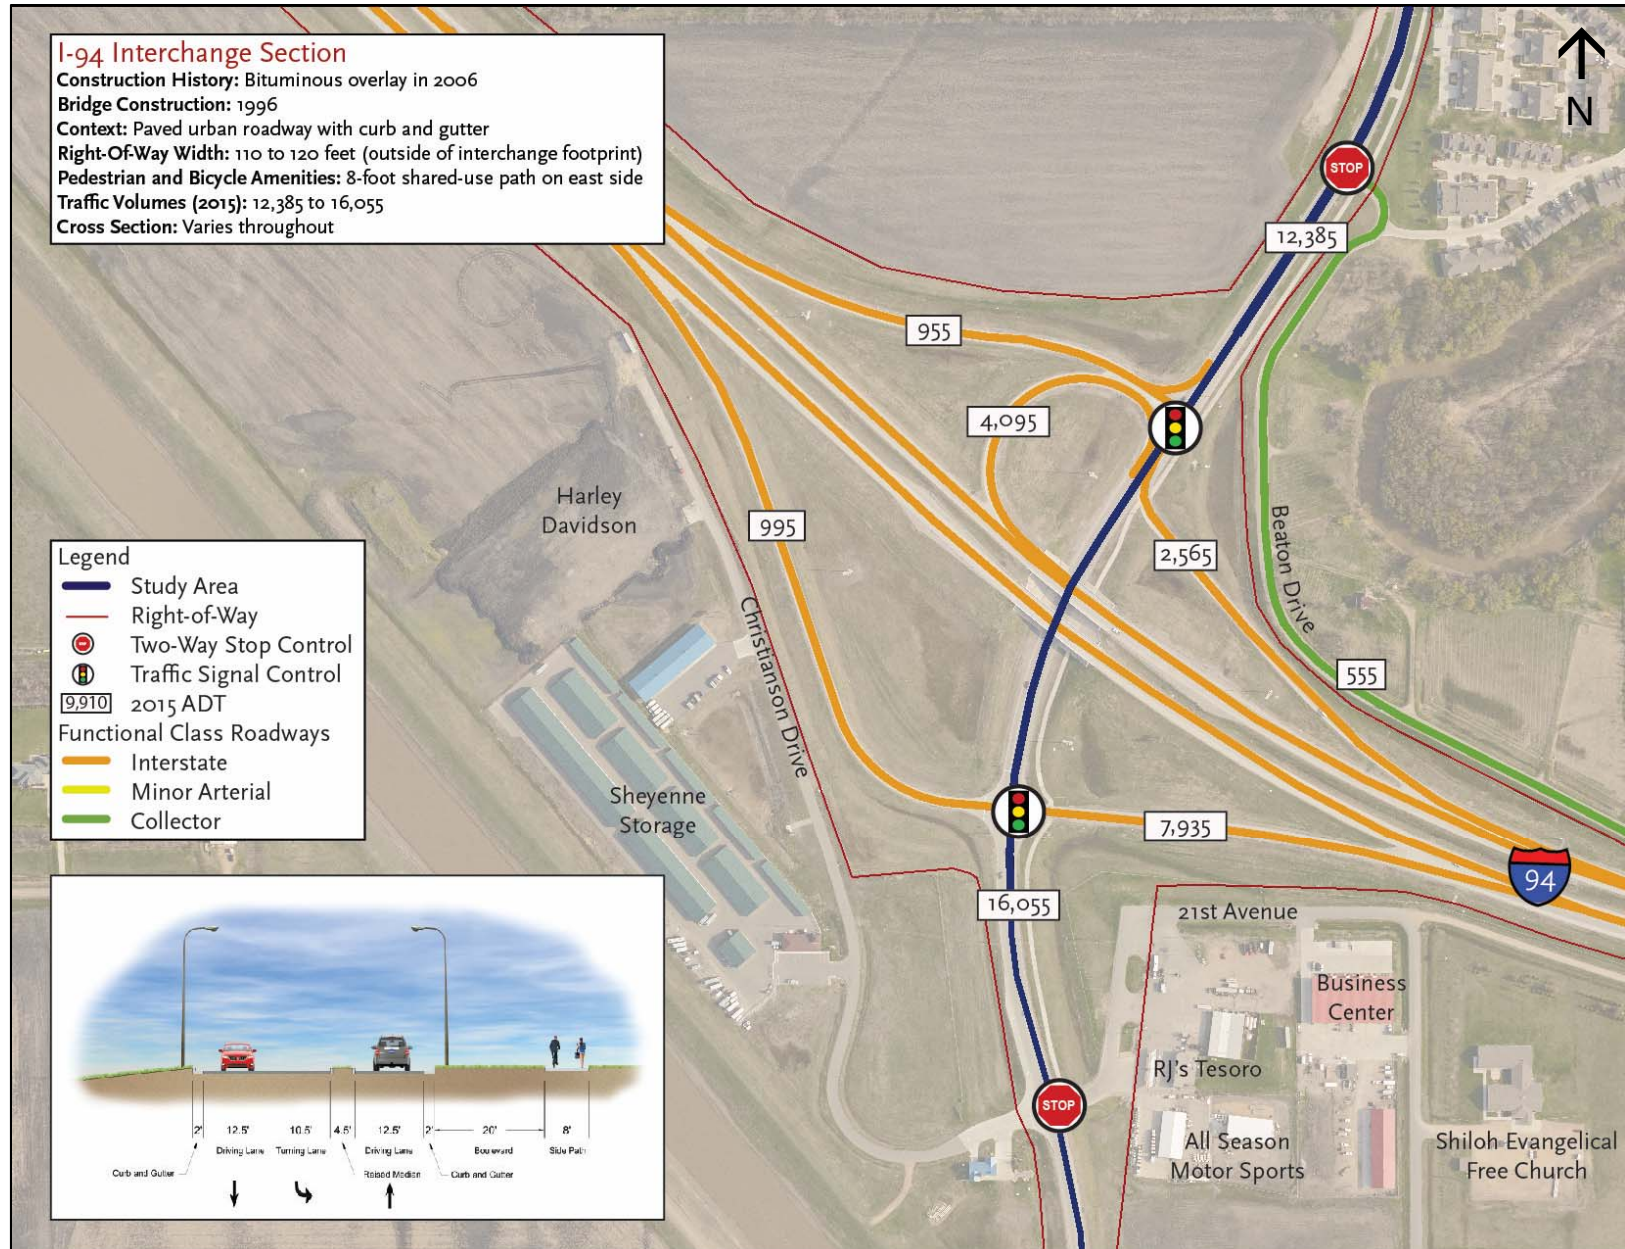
SOUTH SHEYENNE STREET STUDY SECTION
